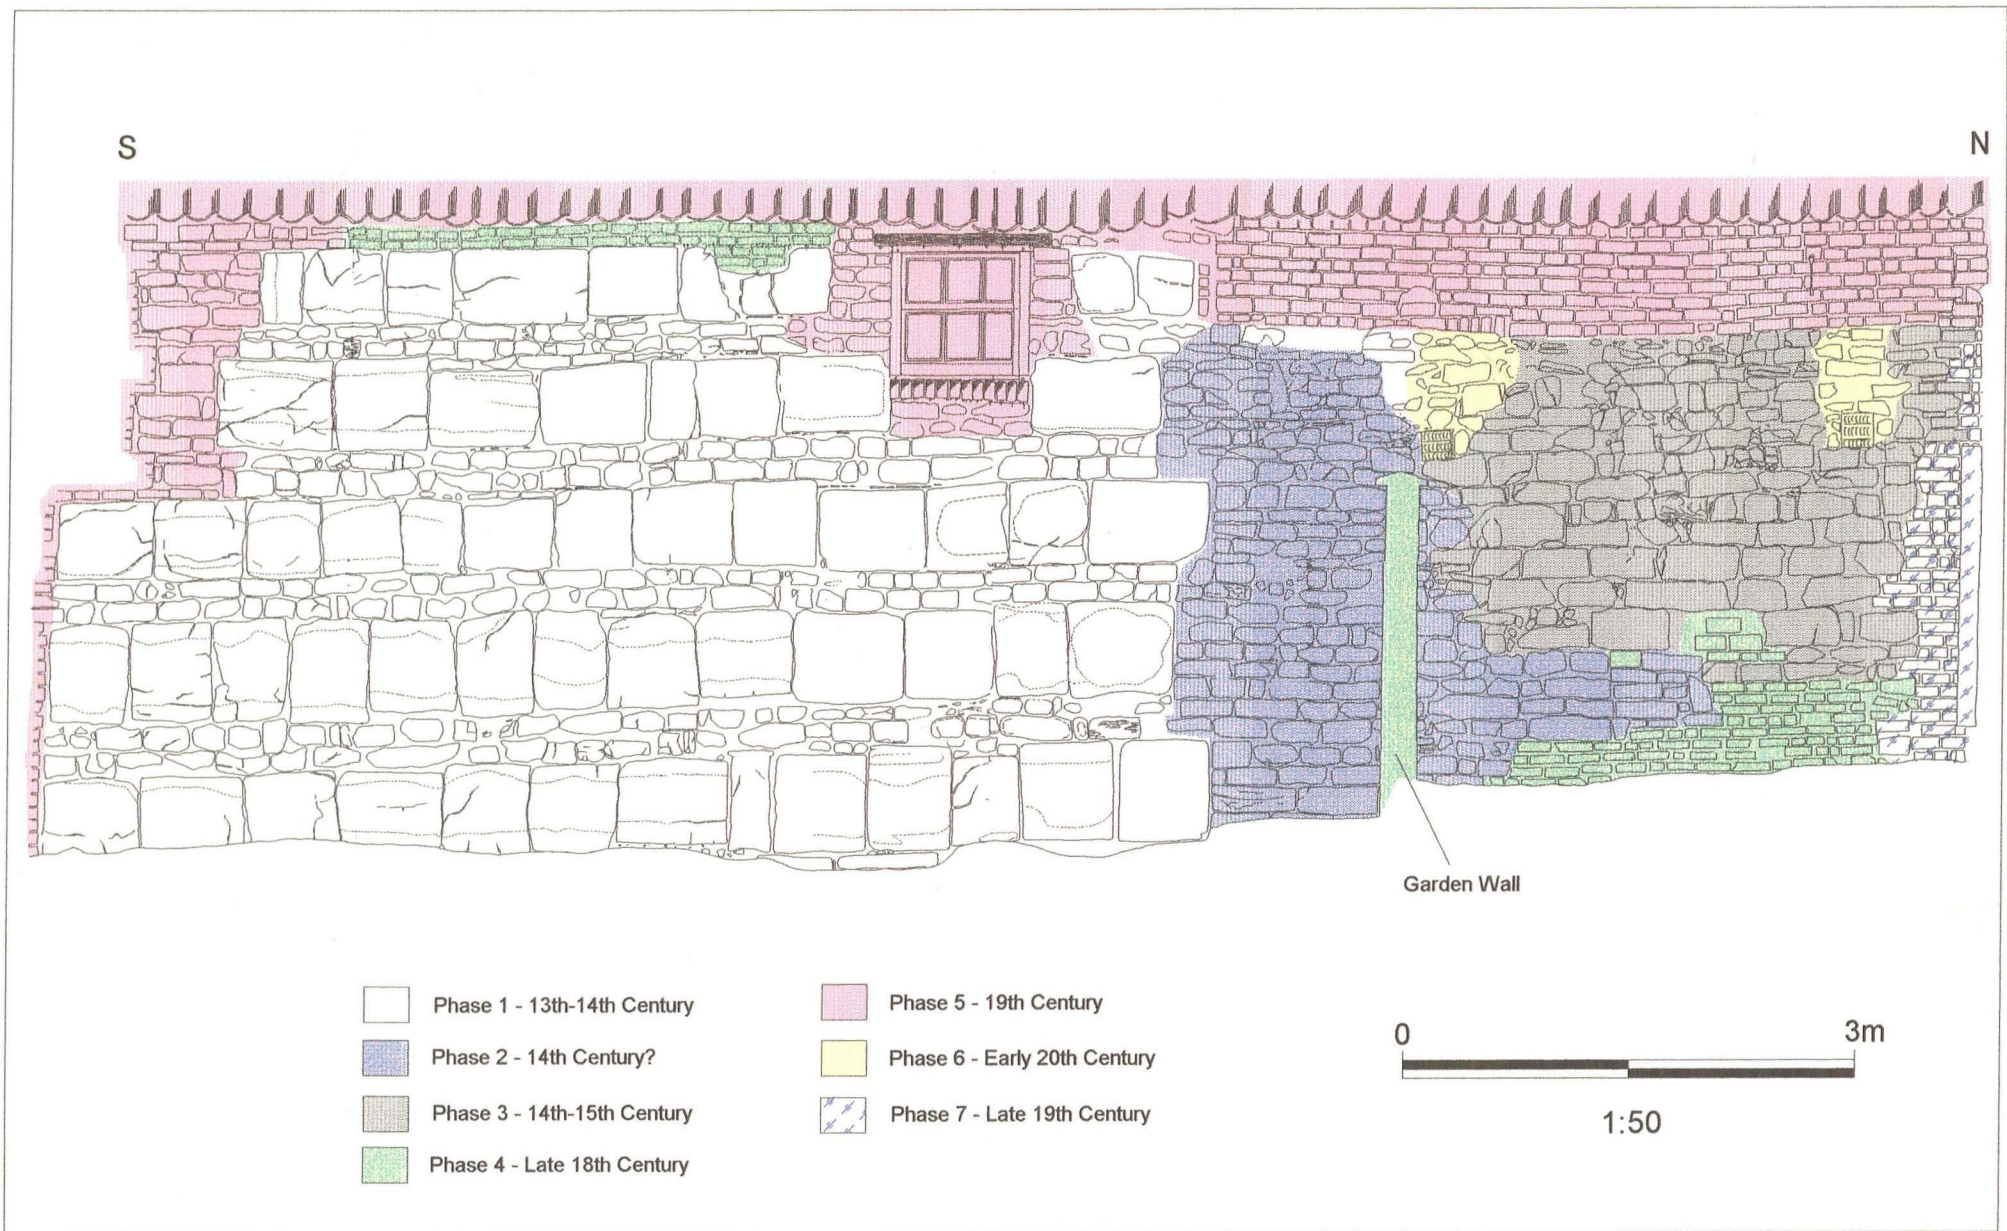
East facing elevation of the Cathedral Close Wall, Pottergate.
